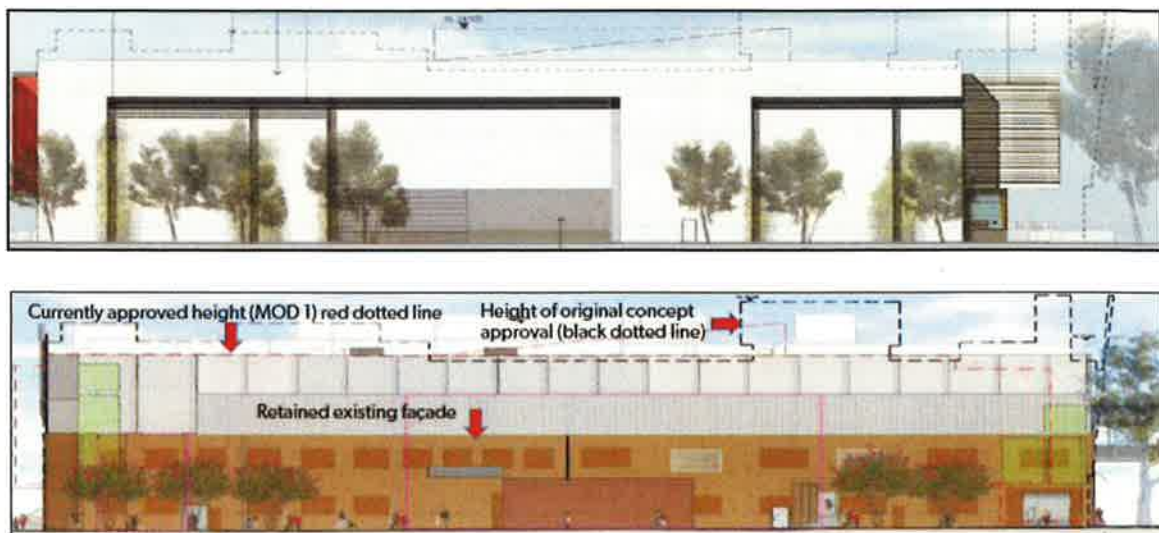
| Murray Street: approved east elevation (top) proposed east elevation (bottom) (Source: Proponent's architectural plans).
